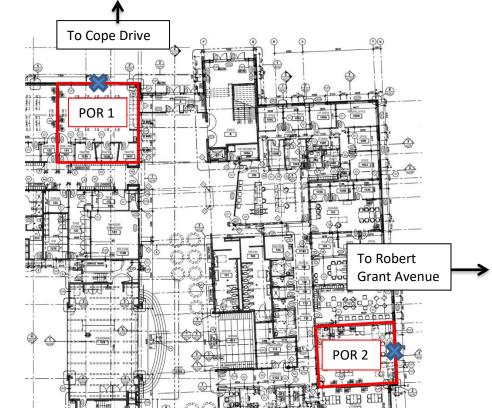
Floor plan section of ground floor (northeast corner) showing the plane of window (POW) points of reception, POR 1 and POR 2
